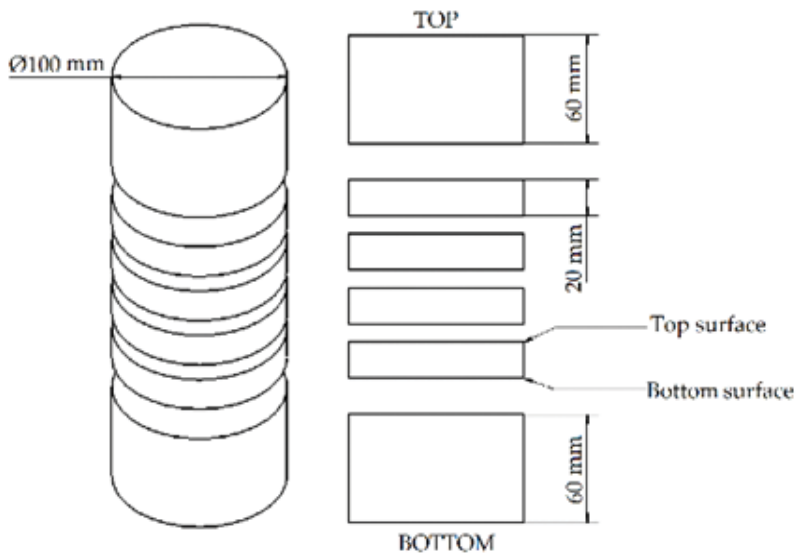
Cutting specimens from concrete cylinders for capillary suction test [4].
